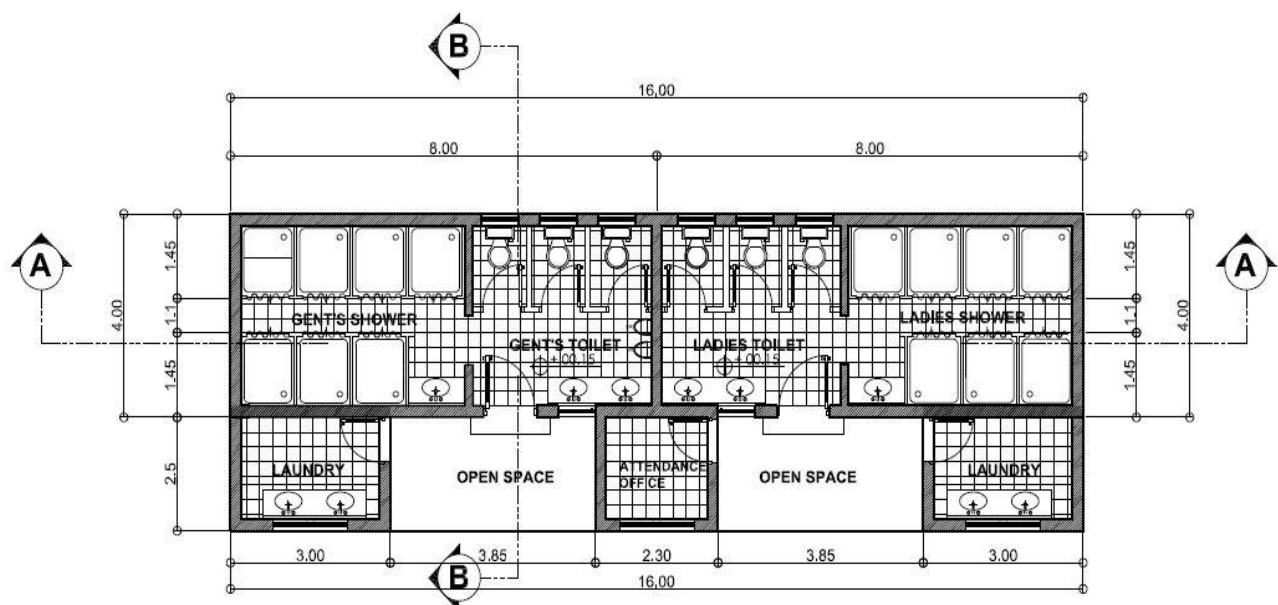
Proposed layout of ablution block at Mchinji Border Post
